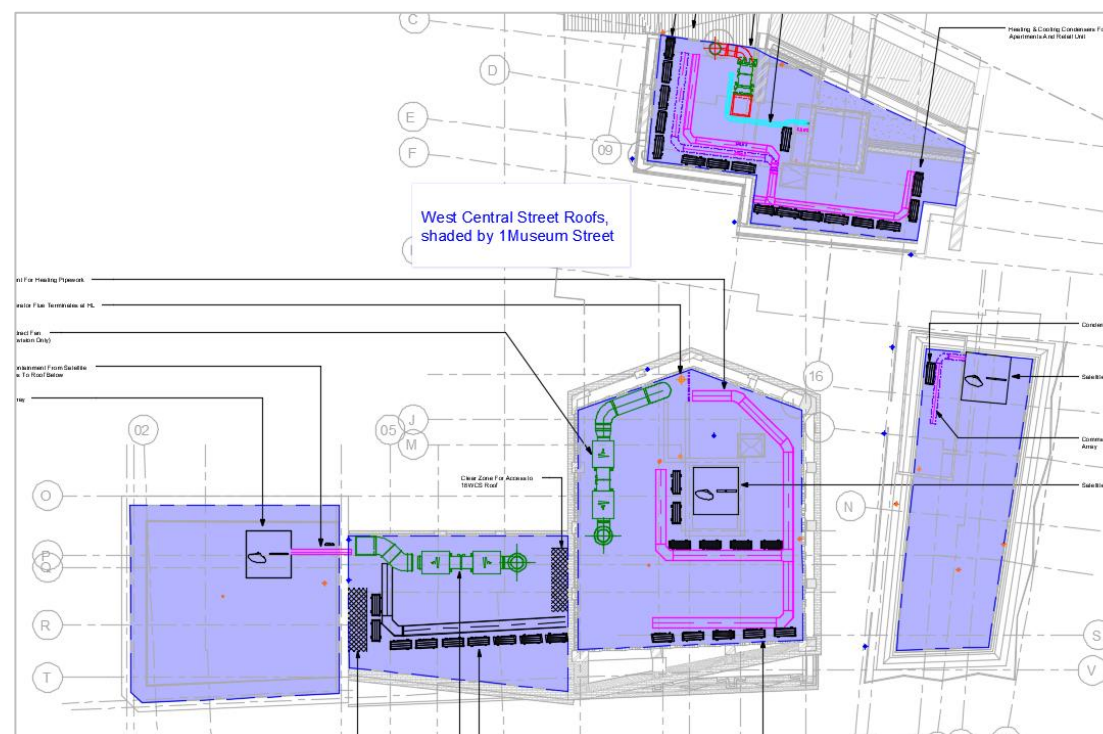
West Central Street roofs, overshadowed by 1 Museum Street
